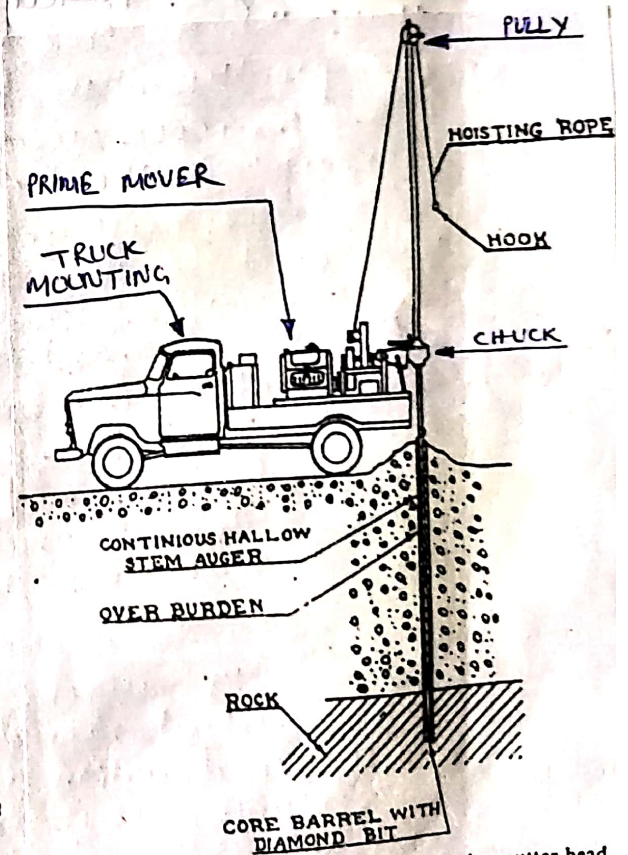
Hollow stem auger facilitates coring below cutter head.
